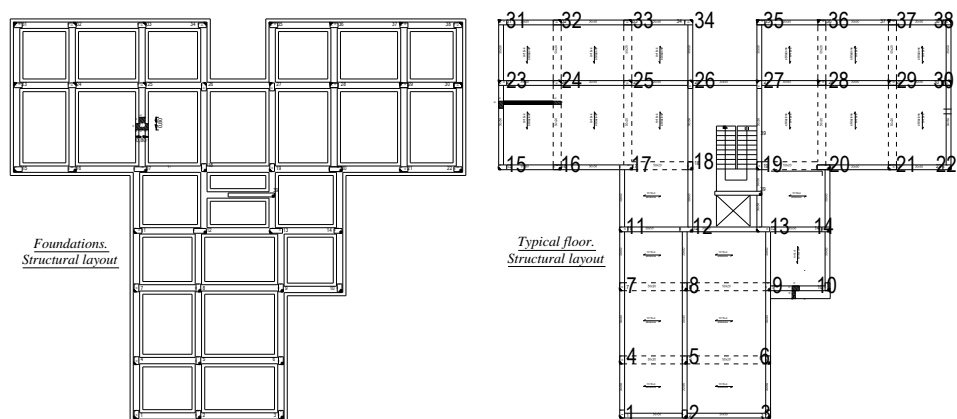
structural plan of the building (foundation system on the left, typical floor on the right).
